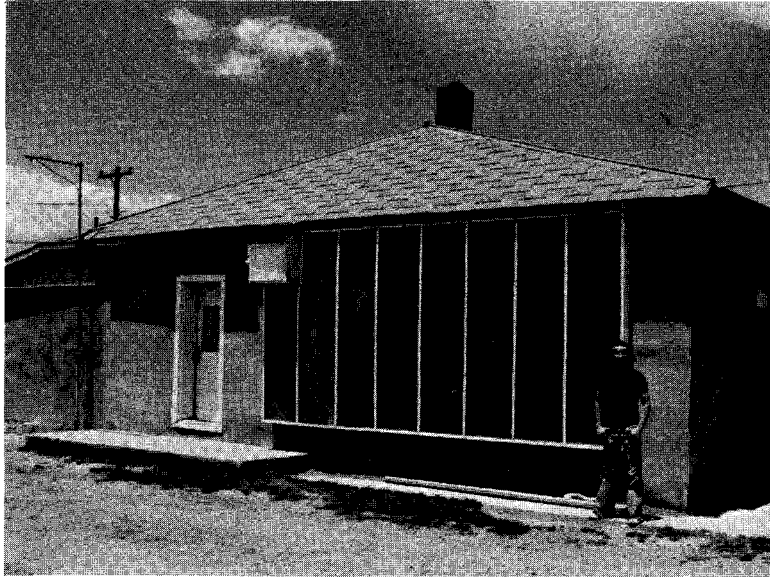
People in the San Luis Valley began building site-built installations to reduce their fuel bills long before tax credits popularized collector construction. This older, owner-built system was constructed from corrugated aluminum roofing material and flat fiberglass glazing. A wall-mounted blower delivers air directly into the house.
